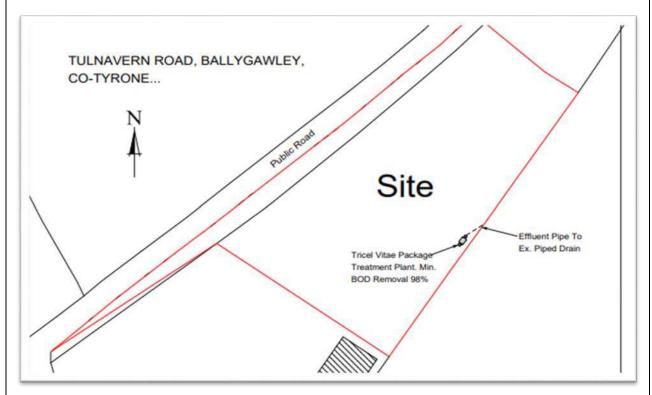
Indicative Sewerage Layout Plan as provided by agent
